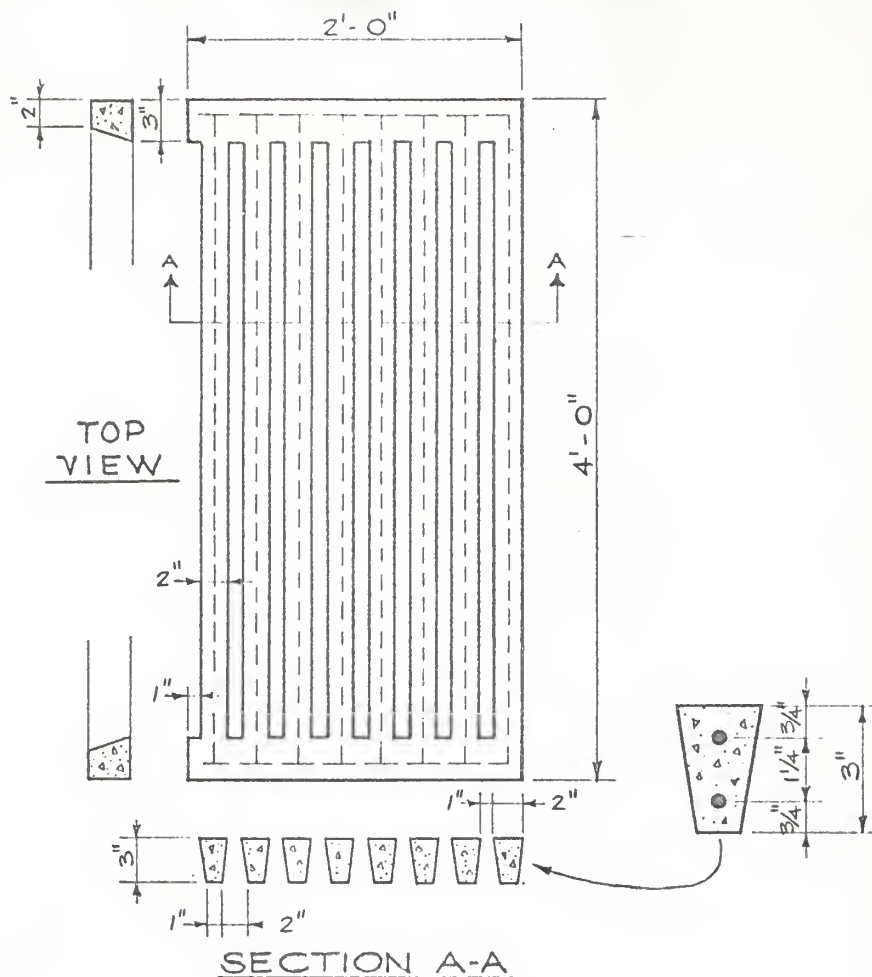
Precast Concrete Floor Grate (source: University of Illinois)
